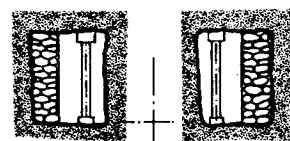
A section through the partially-excavated new rail tunnel, showing the lining completed before all excavation had been carried out.
